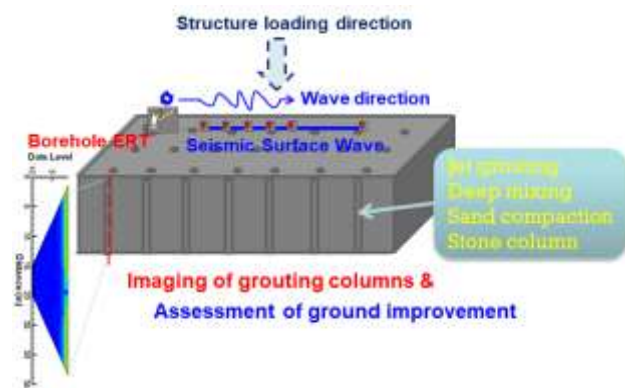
Illustration showing a jet grouting site and how in-hole ERT and seismic surface wave can be used to image grouting column and assess overall level of reinforcement.
